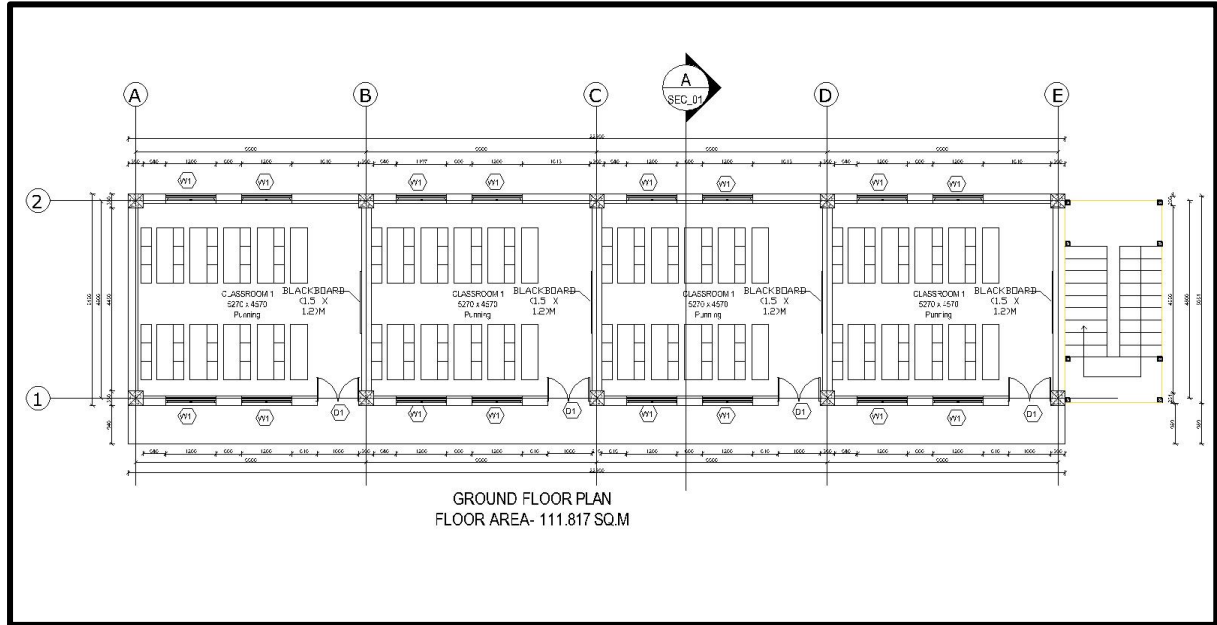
General Layout of the Proposed Building (Ground Floor Plan)
